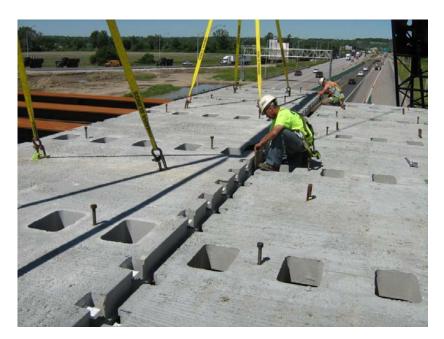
Precast Full Depth Deck Installation
